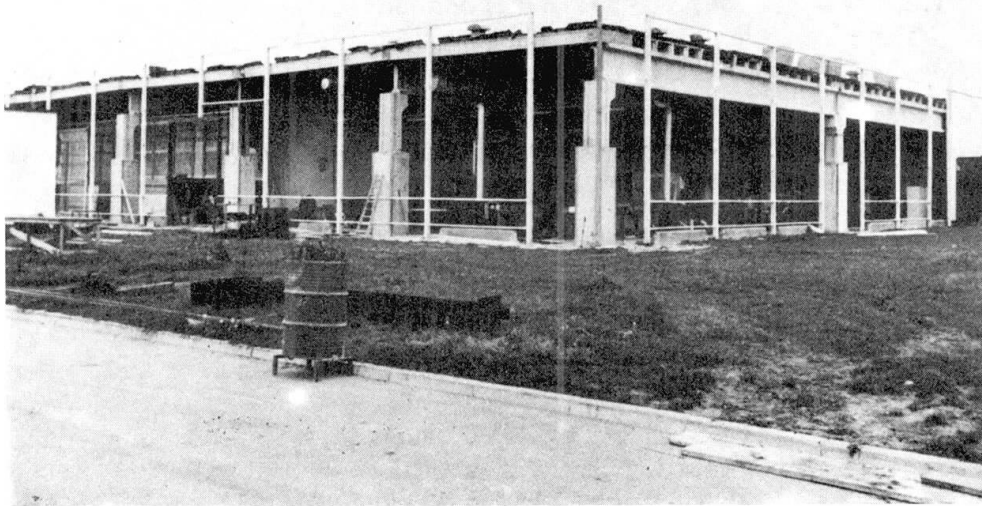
(after September 15th): Factory building near Artegna, after repair, without further earthquake damage. In order to increase the carrying capacity, the concrete columns were surrounded with a 15 cm strong concrete sheath. The earthquake load was reduced by replacing the heavy concrete façade elements by a light metal façade.
